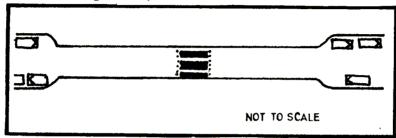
FOOTWAY WIDENING OR "NECKING" AT JUNCTION (Sheffield)
